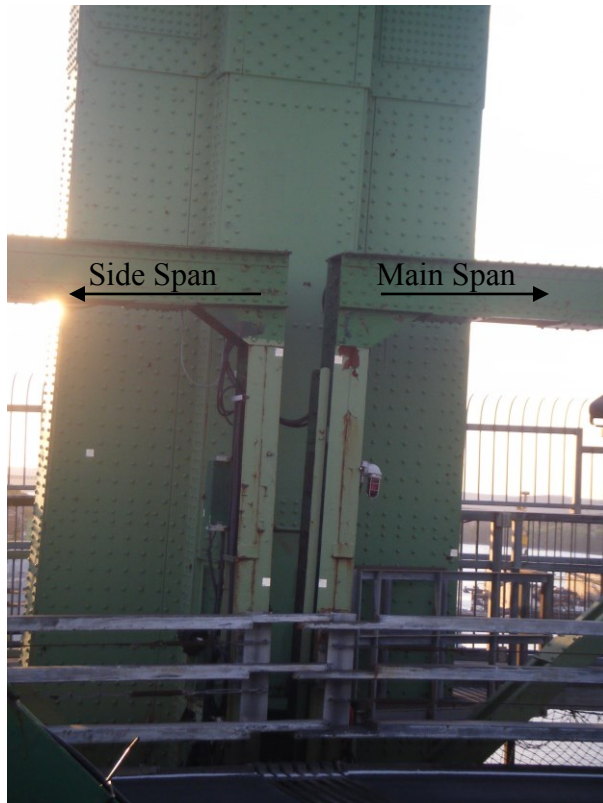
Stiffening truss, looking towards Dartmouth from walkway
